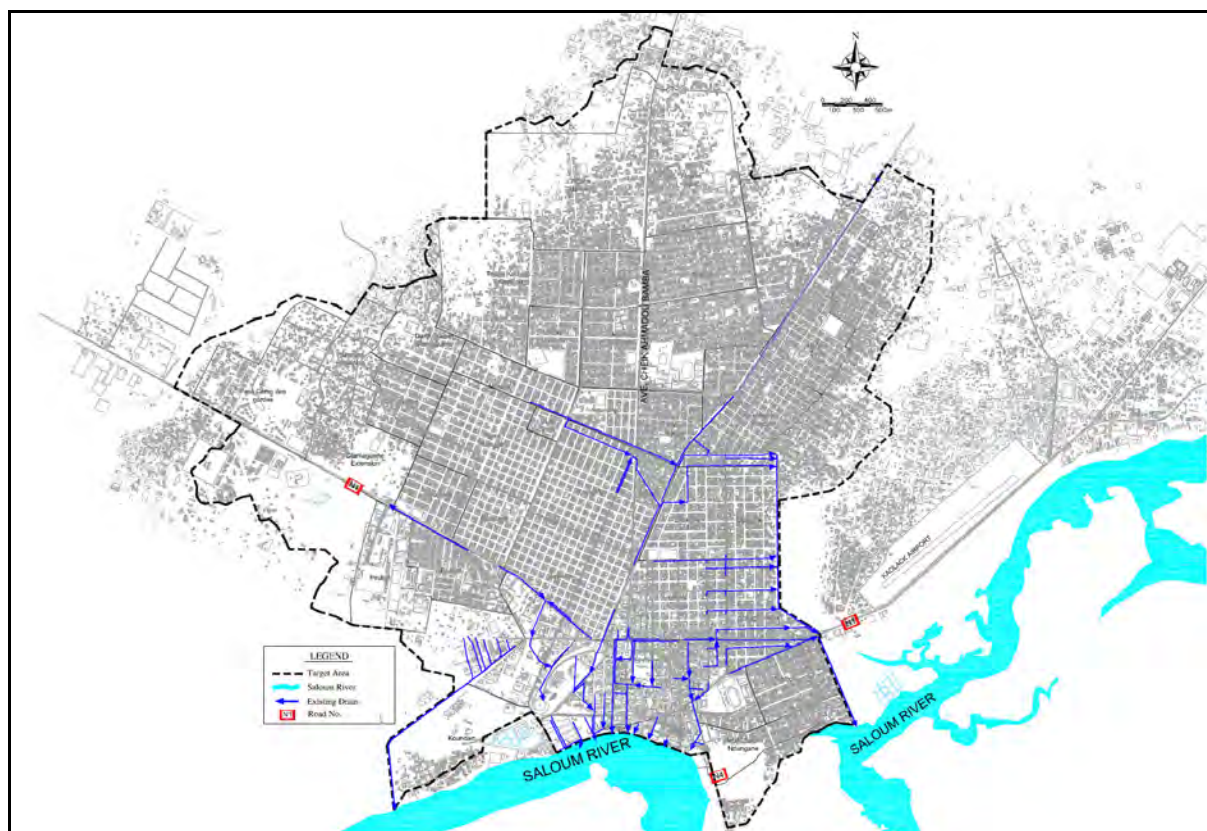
Target Area for Stormwater Drainage Planning
